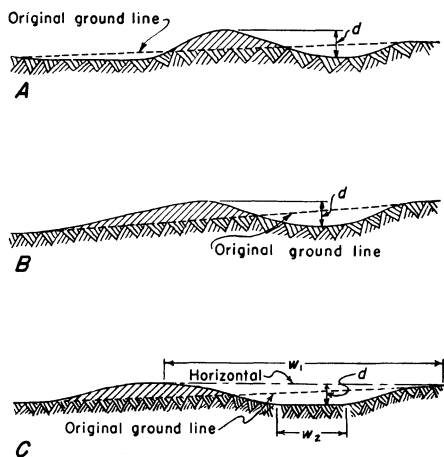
Diversion-ditch cross sections: *A*, Terrace-type diversion ditch on relatively flat slopes. Construction from both sides. Minimum value of  $d$  about 18 inches. *B*, Terrace-type diversion ditch on steeper slopes. Construction generally from the upper side only. Minimum value of  $d$  about 18 inches. *C*, This type of diversion ditch is suggested for drainage areas exceeding 10 acres, especially on the steeper slopes.  $d$  should be a minimum of 22 inches. Side slopes should be at least 4:1 where land slopes permit. The approximate water cross-sectional area of the ditch is  $\frac{(w_1 + w_2)}{2} d$ .
